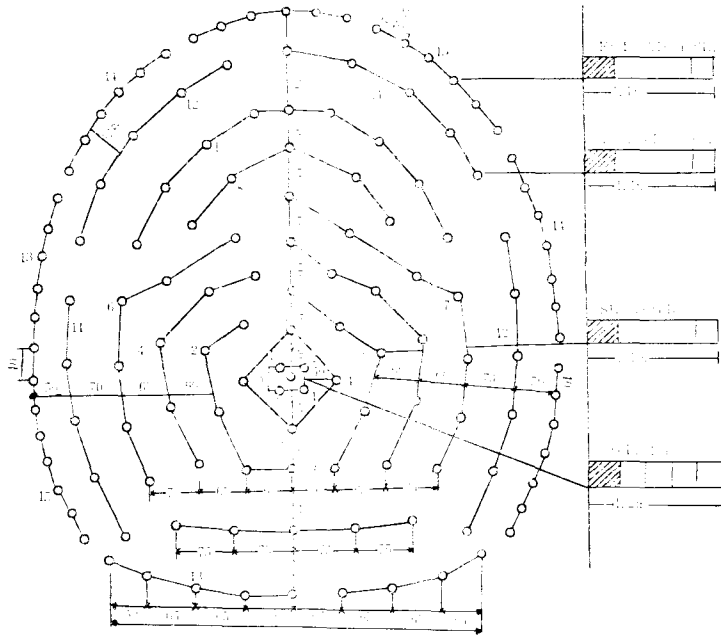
; Drilling & blasting pattern (rock type 1)
